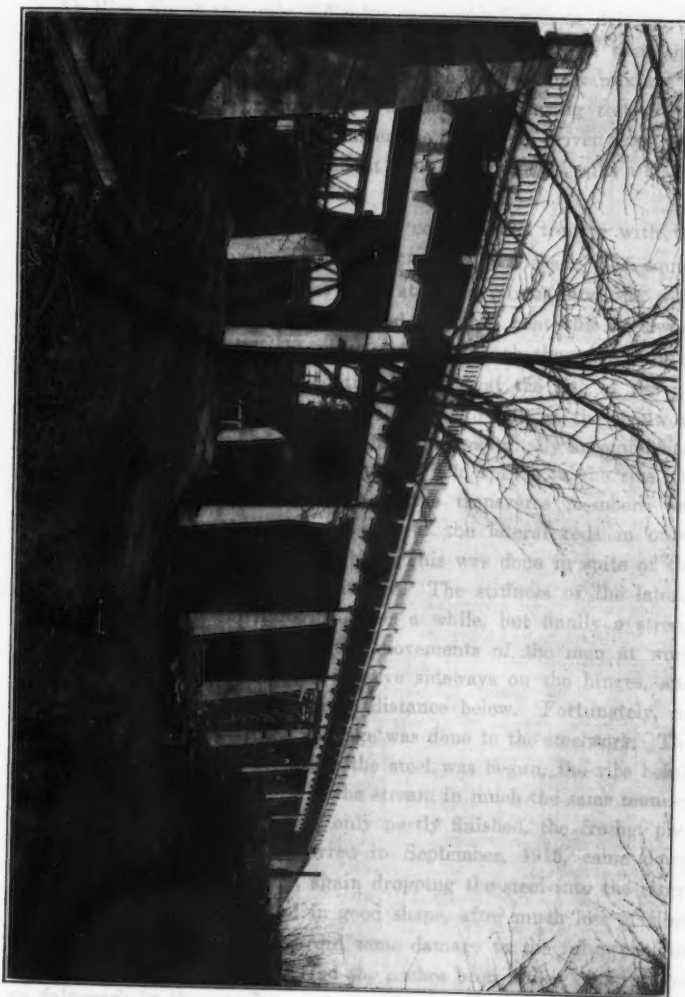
WEST SEVENTH STREET VIADUCT.
